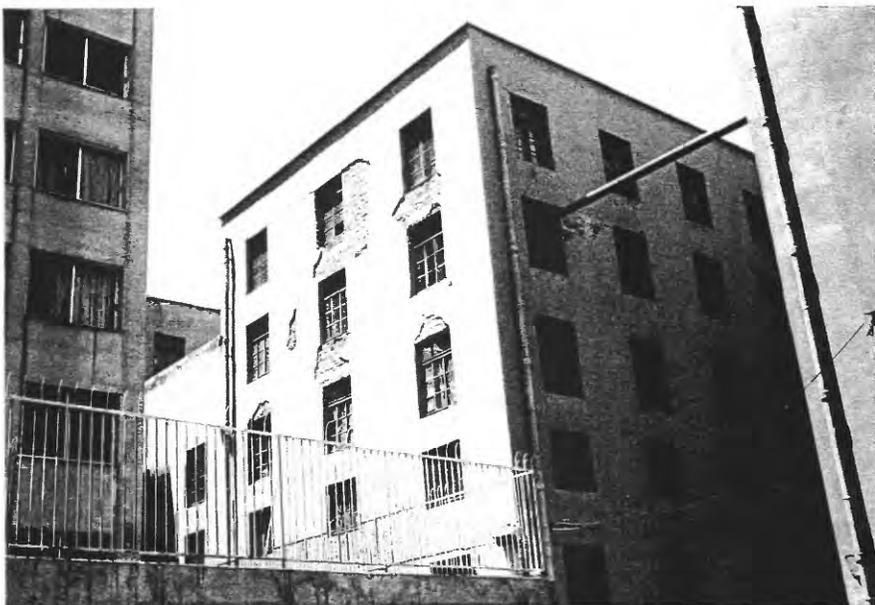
Spalled exterior plaster on a medium rise building in Thessaloniki.
